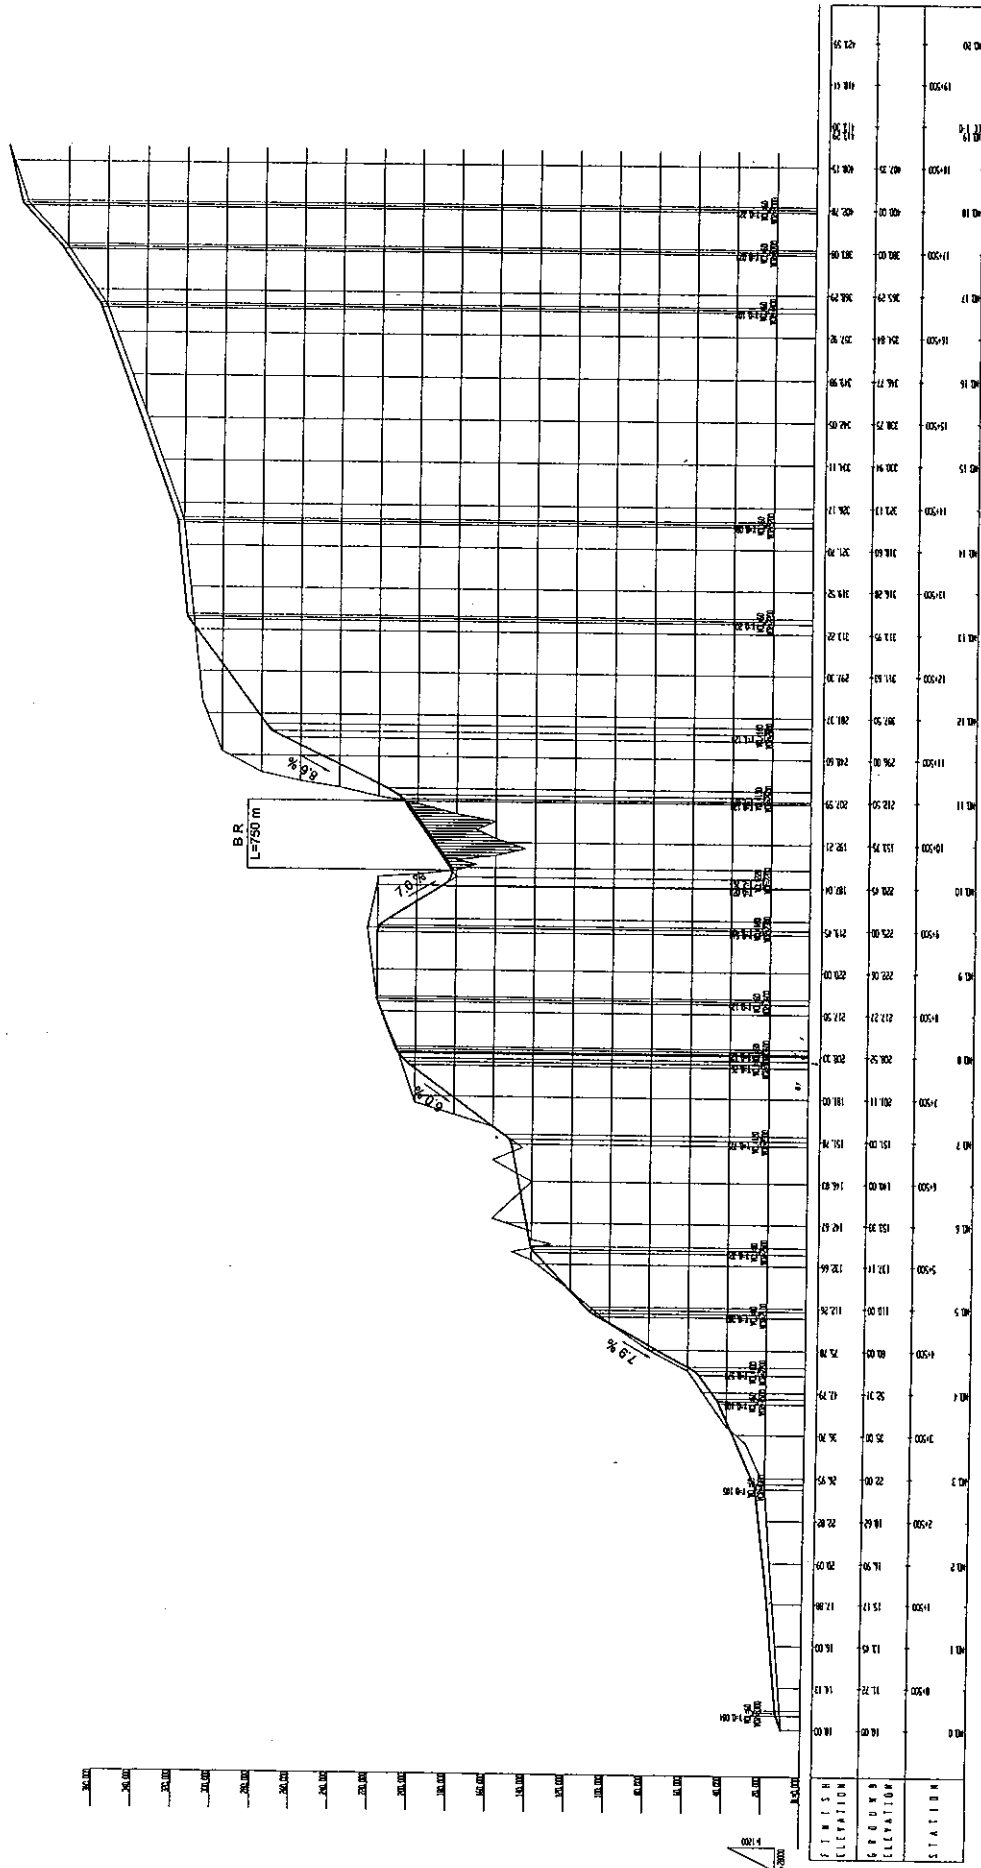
(4/5) MINDANAO CONTAINER TERMINAL - BUKIDNON LINK ROAD: PROFILE OF ALTERNATIVE-3
